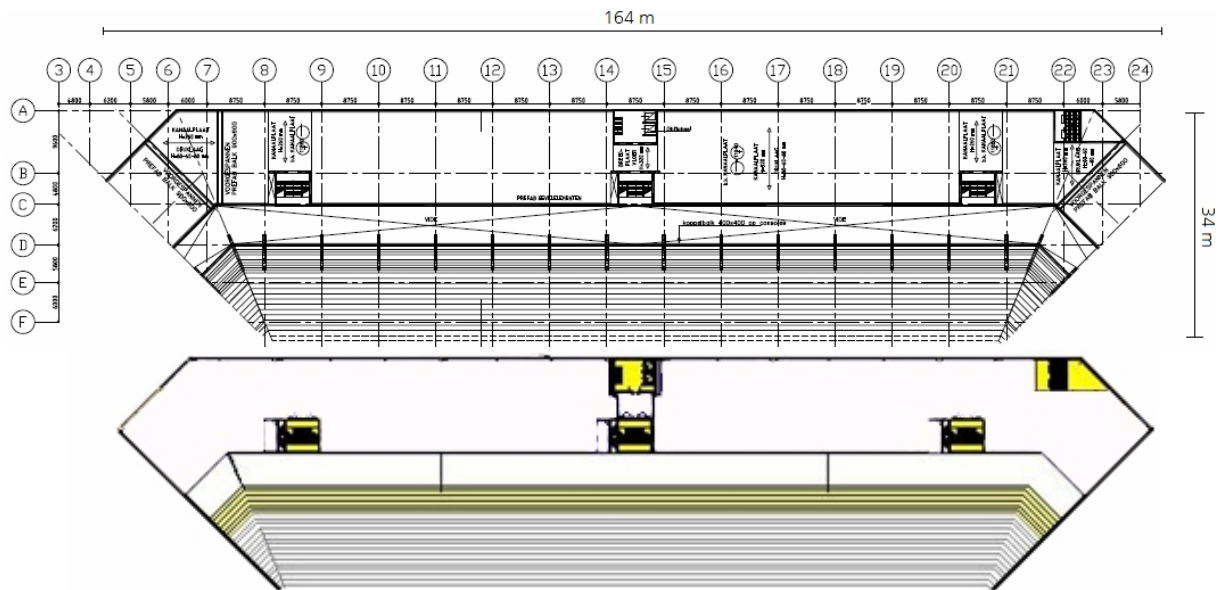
Structural and functional plan for the 1<sup>st</sup> floor
